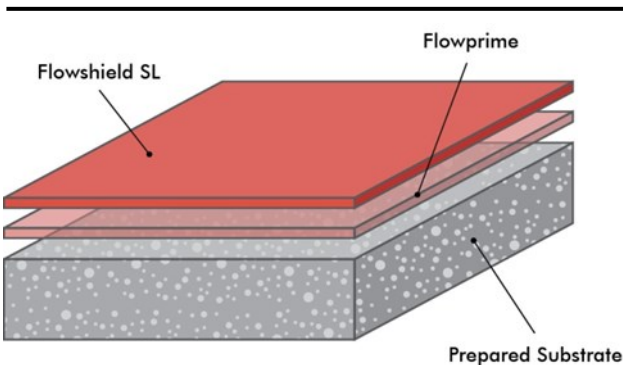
Indoor epoxy flooring basically requires a substrate, primer coat, and final coat. Source: https://www.sydneyepoxyfloors.com.au/garage_epoxy_flooring
